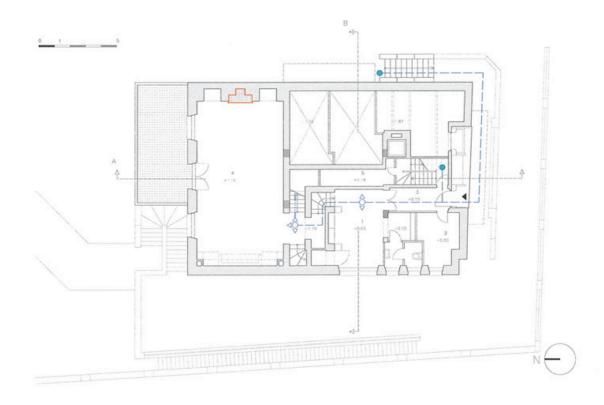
Main Floor Plans of Muller House by Adolf Loos. Source: http://www.mullerovavila.cz
